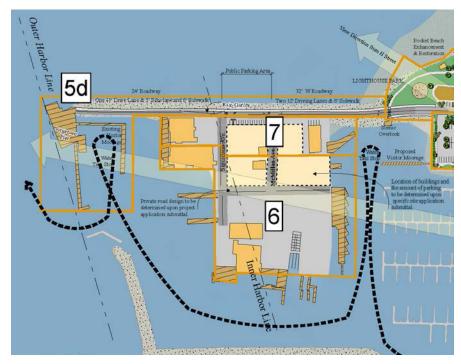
Planning Area 6-Shipyard Industrial Park Conceptual Plan
